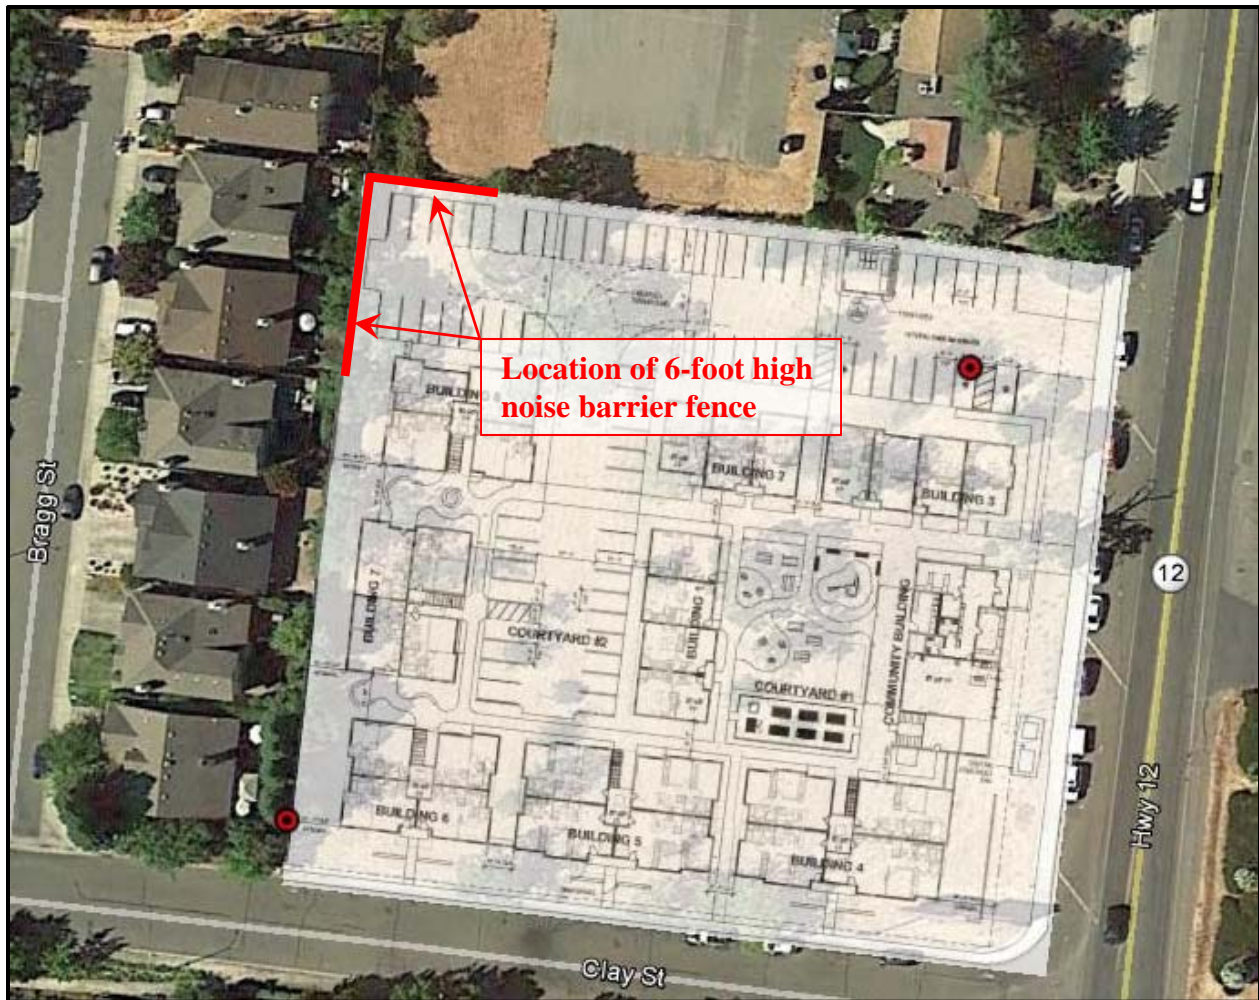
Project Site Plan with Needed Interior Noise Mitigation
